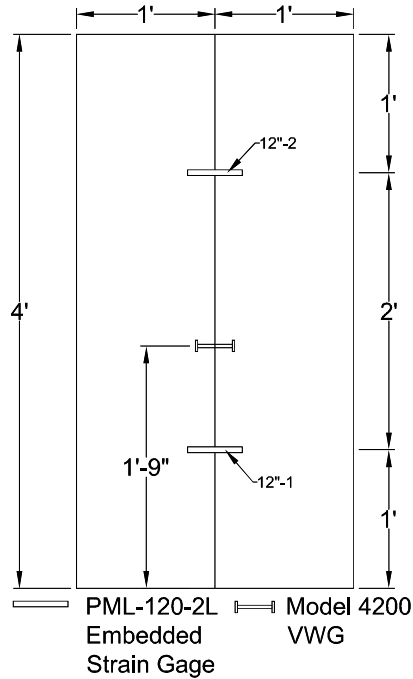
Plan View of Strain Gages 12 in. Above Bottom of Precast (All Specimens)
